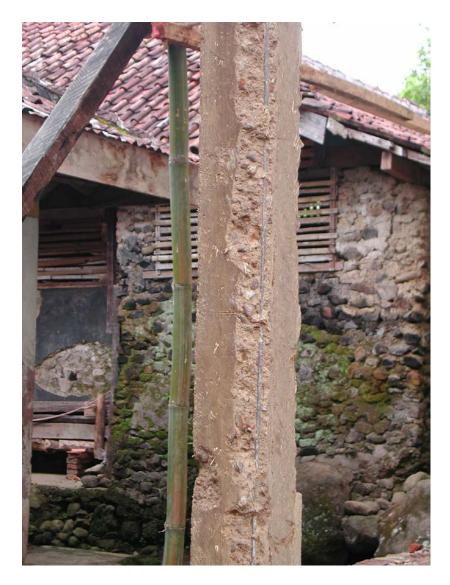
SDN Banjar Negara 1 showing very poor concrete
